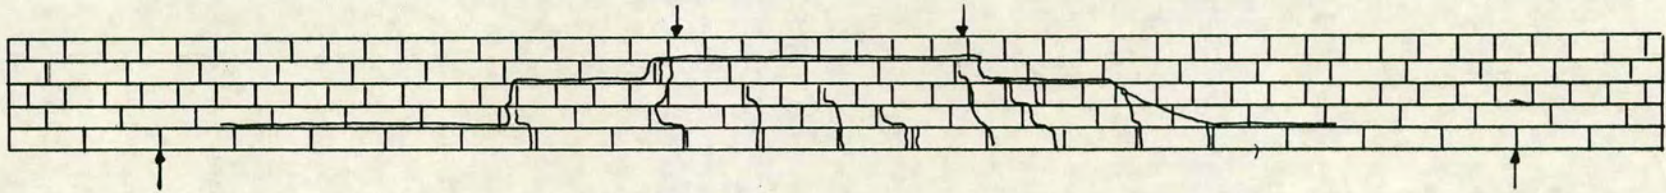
Flexure-Shear Crack in a Partially Prestressed Brickwork Beam ($a/d = 6.0$)
